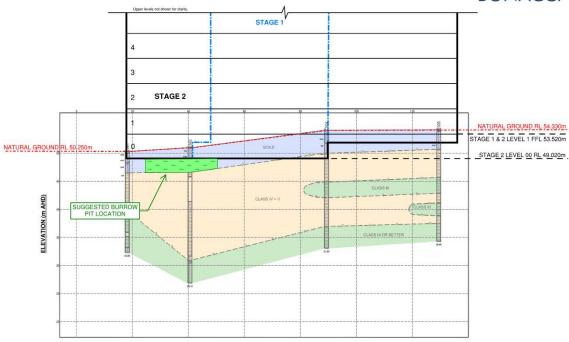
B - Suggested Burrow Pit Location for Contaminated Fill
